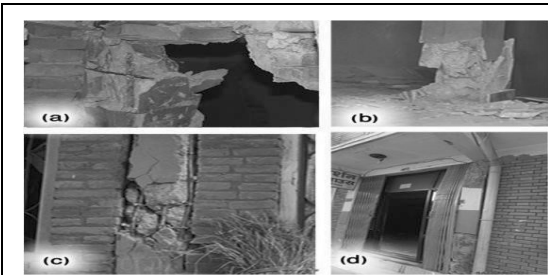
Column failure: (a) shear failure; (b) flexural failure; (c) brittle failure; and (d) Buckling failure.
